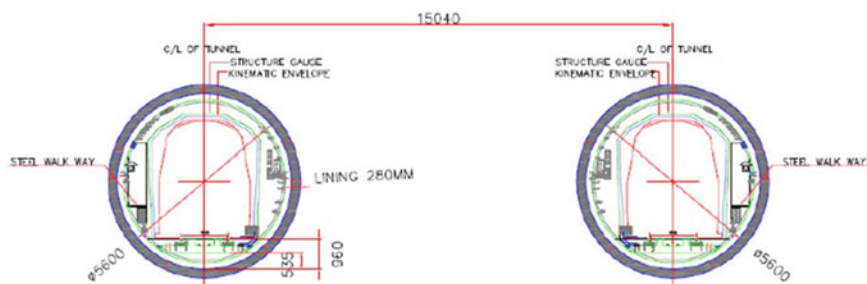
Cross section of Bangalore Metro Underground Tunnel [6, 9, 10]
